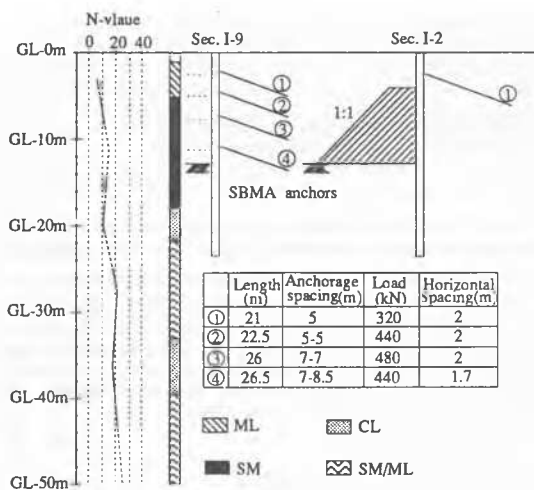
Profiles of soils, typical excavation sections, and tieback anchors
